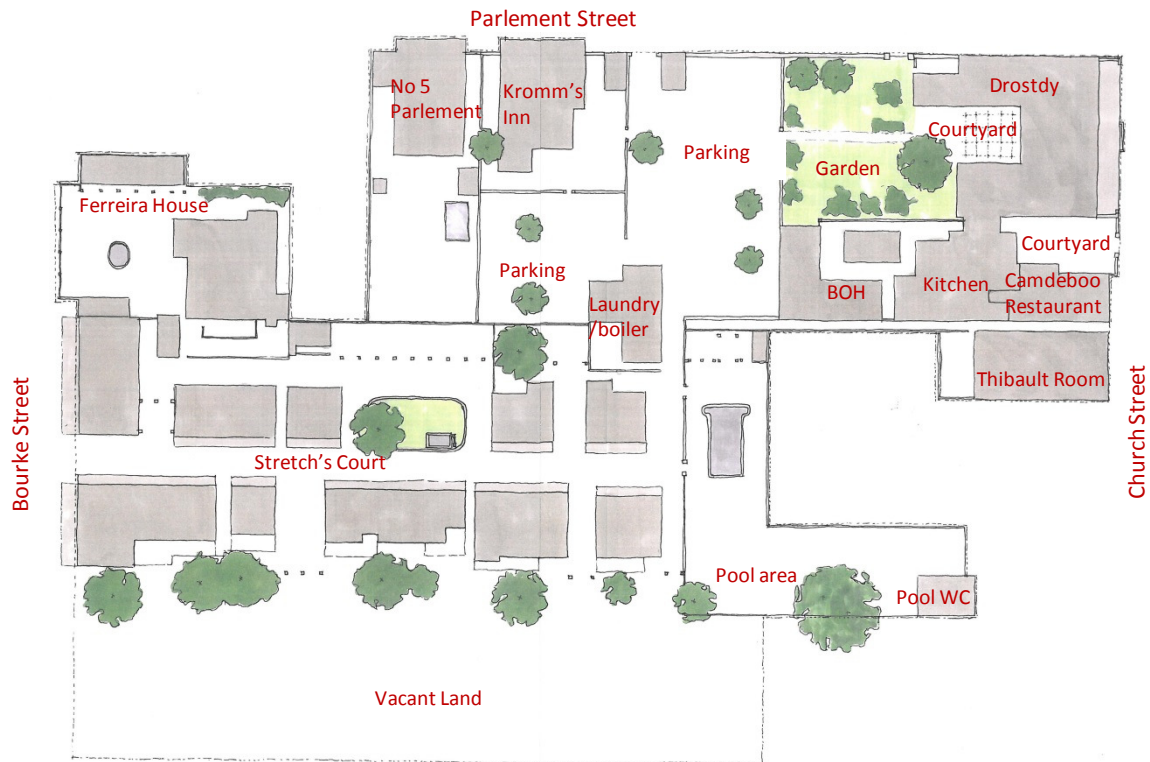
Indicative existing site layout [refer to Annexure B: dhk Architects]
